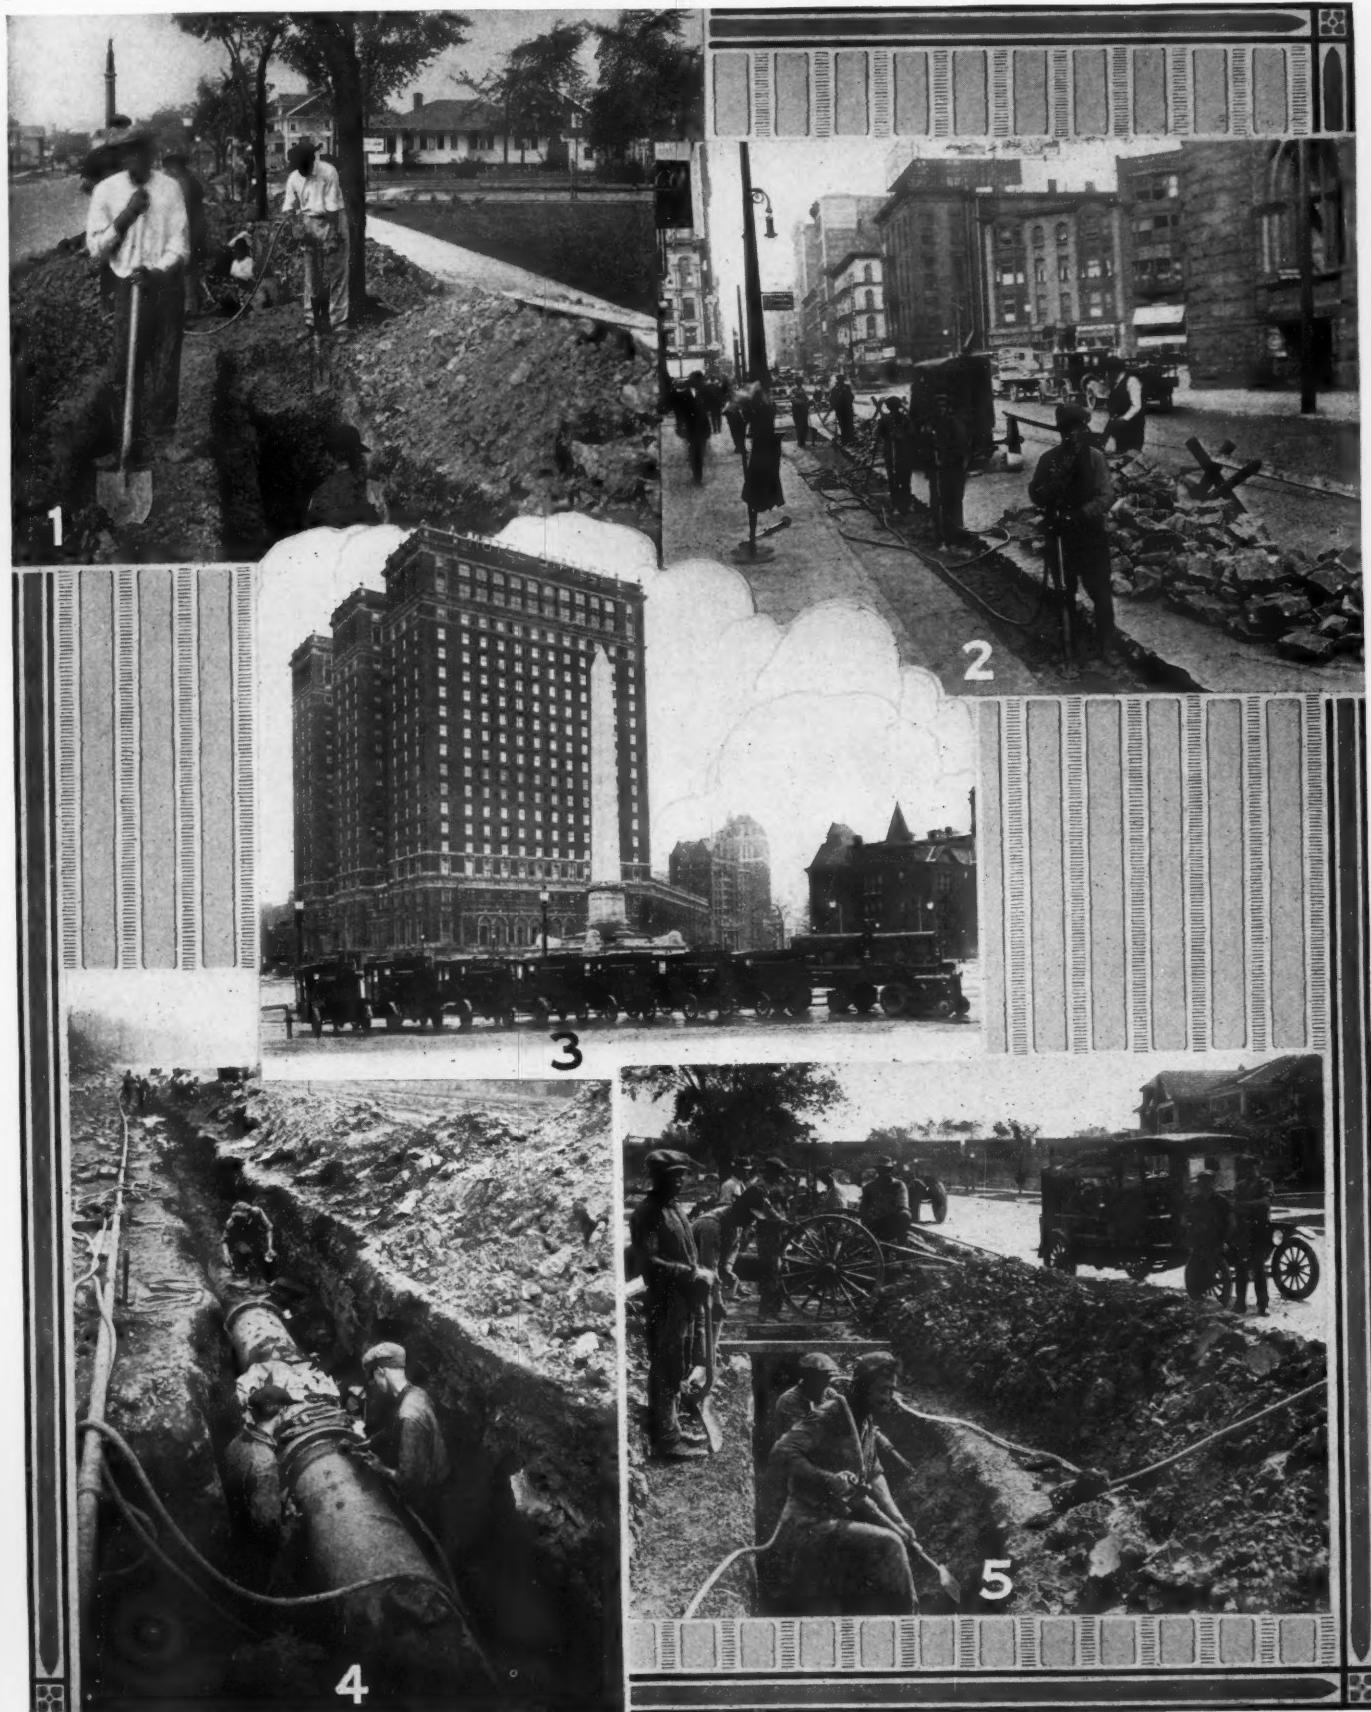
Air-driven trench digger loosening clay in an excavation for gas mains.
